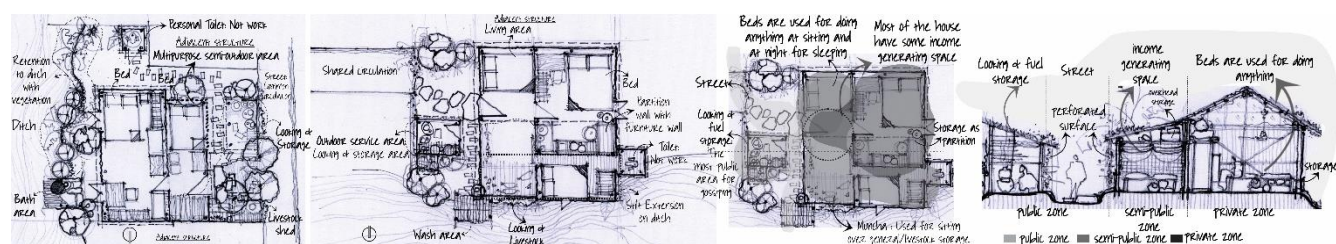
Built form in the railway slum mud plinth (left), stilt type (right); multiple use of single space in plan (left); and in section (right) (source: author)
